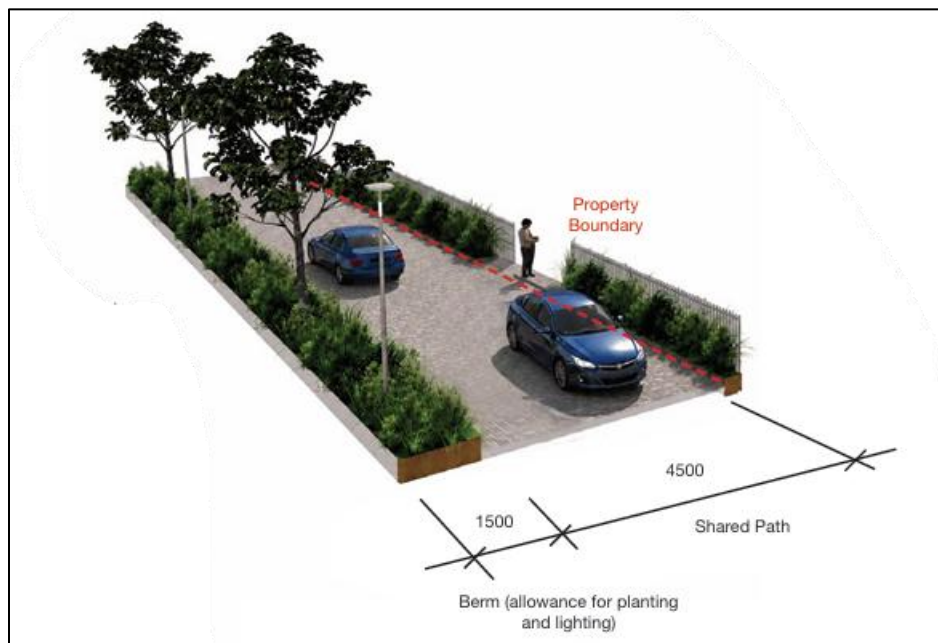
6m Legal width JOAL - cross section (JOAL serving fewer than 6 lots)
